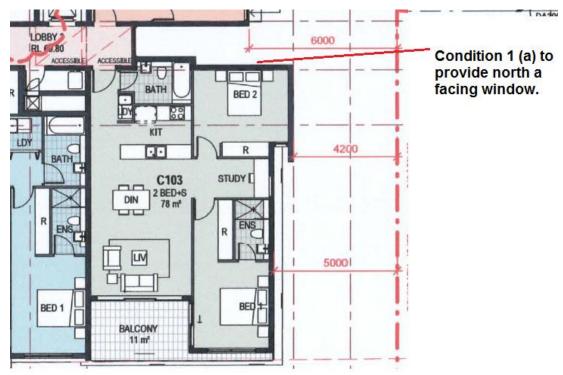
Typical layout of apartment C03. Condition 1(a) imposed to provide north facing window to bedroom 2 to improve solar access to the room.
